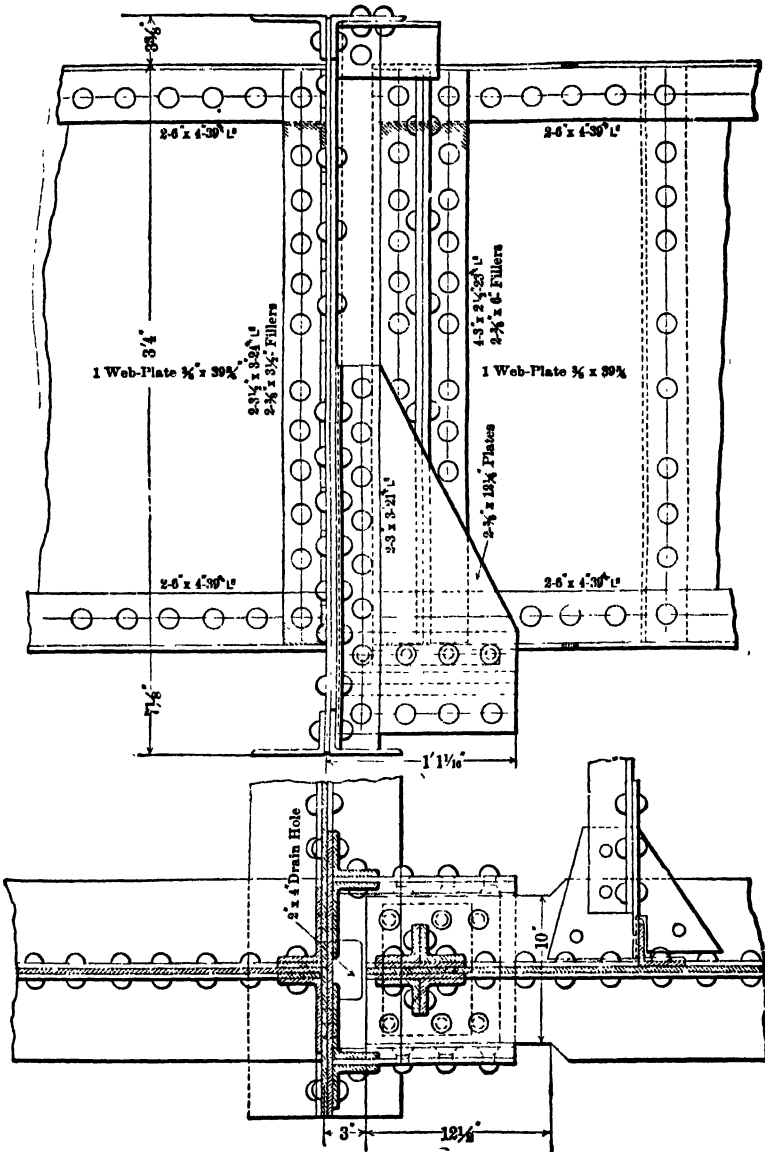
Details of Expansion Pocket for Elevated Railroads.
